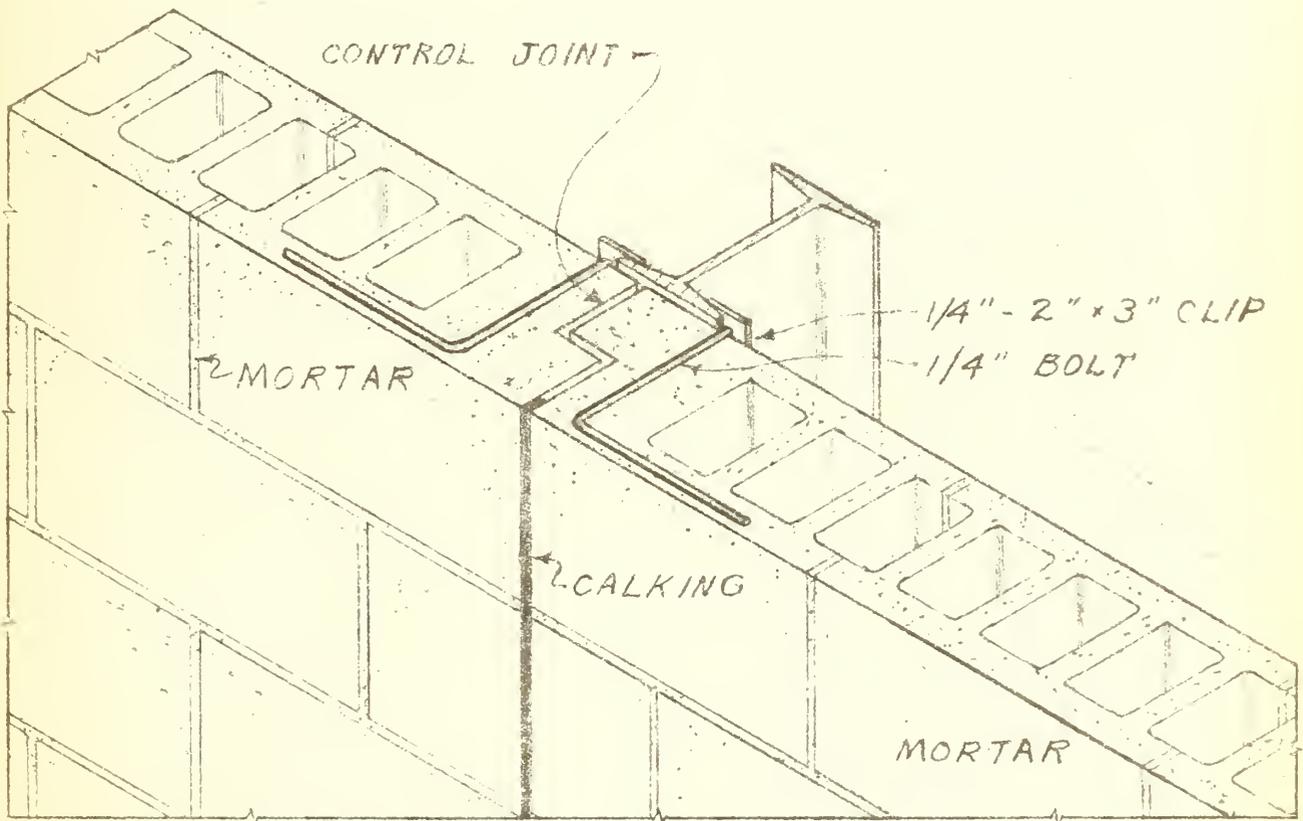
TYPICAL CONTROL JOINT USING STANDARD STOCK JAMB BLOCK AND METAL CLIPS & BOLTS
